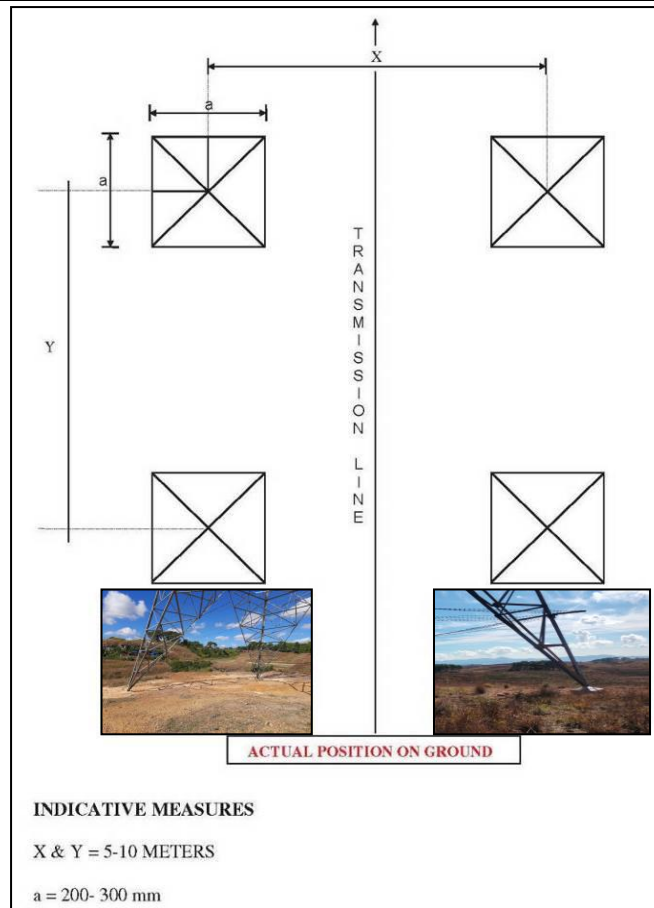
Typical Plan of Transmission Line Tower Footing Showing actual Ground Position and Extent of Impact
